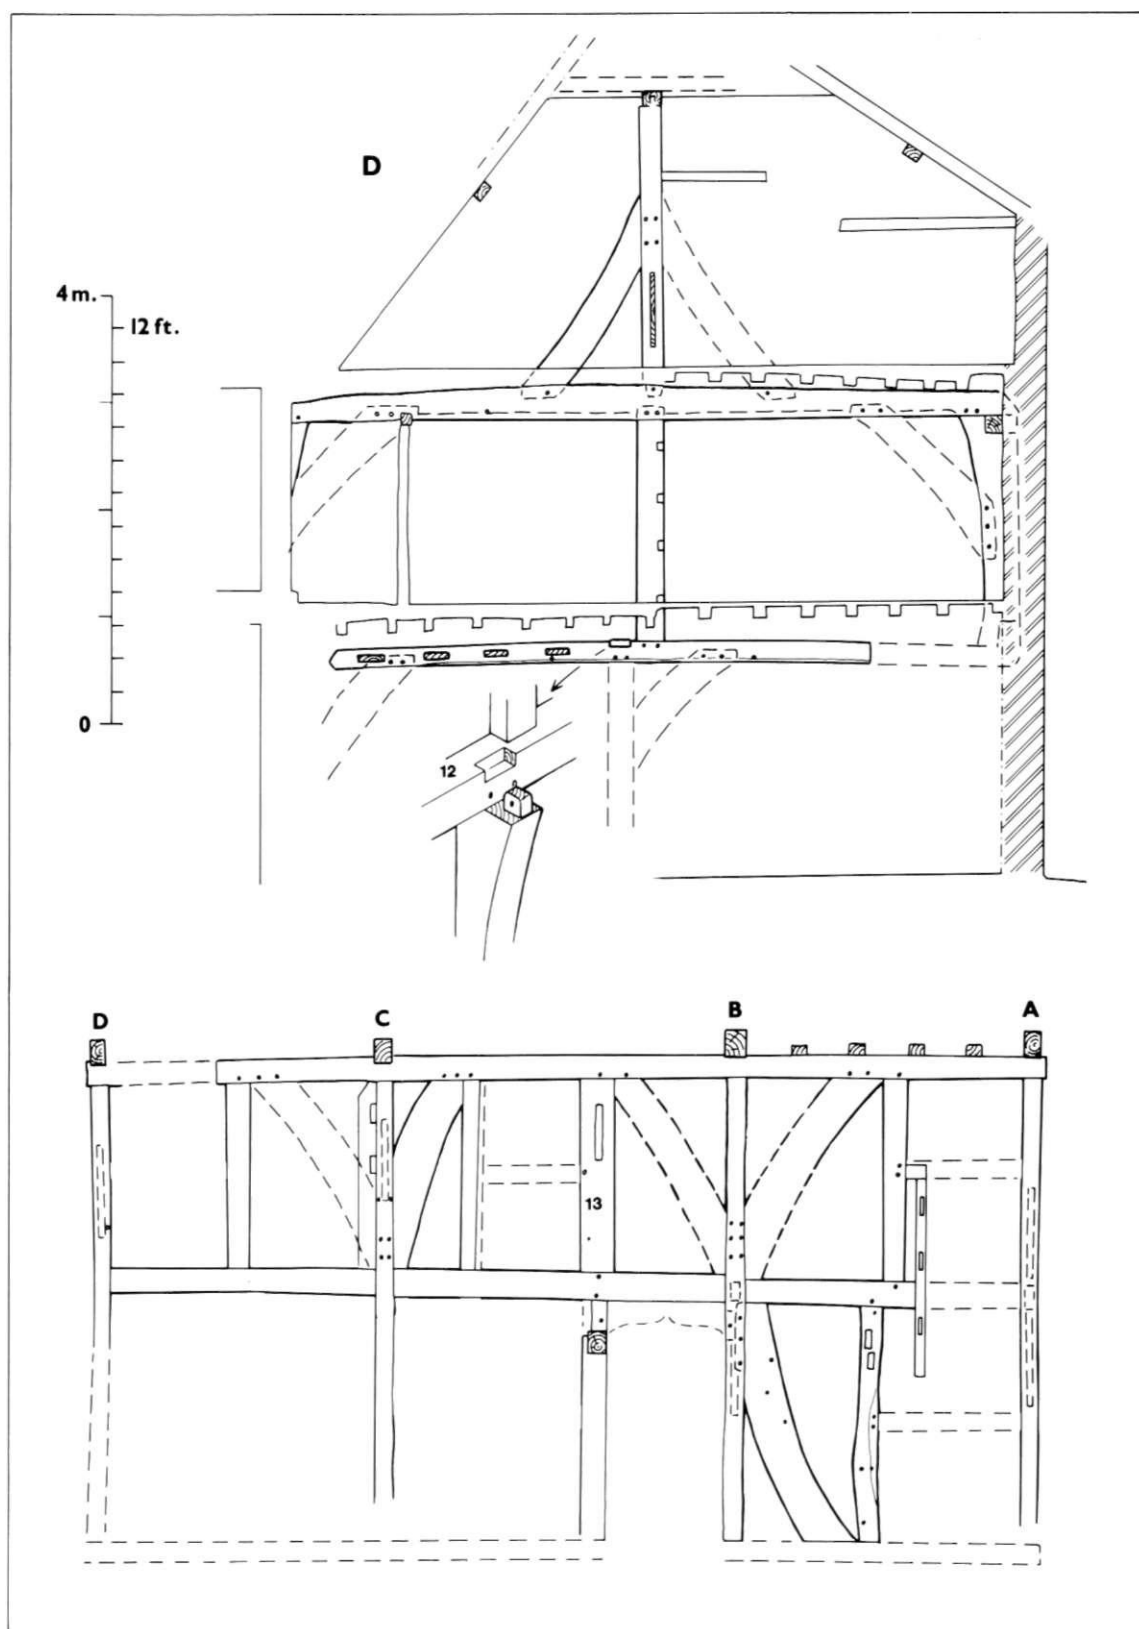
East gable wall of 186, Horninglow Street: truss D, and rear elevation A-D.
